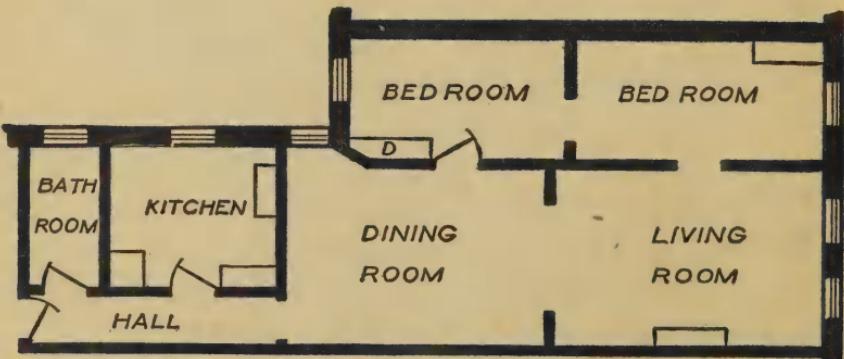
After studying this floor plan try to make one of your own apartment or house.
